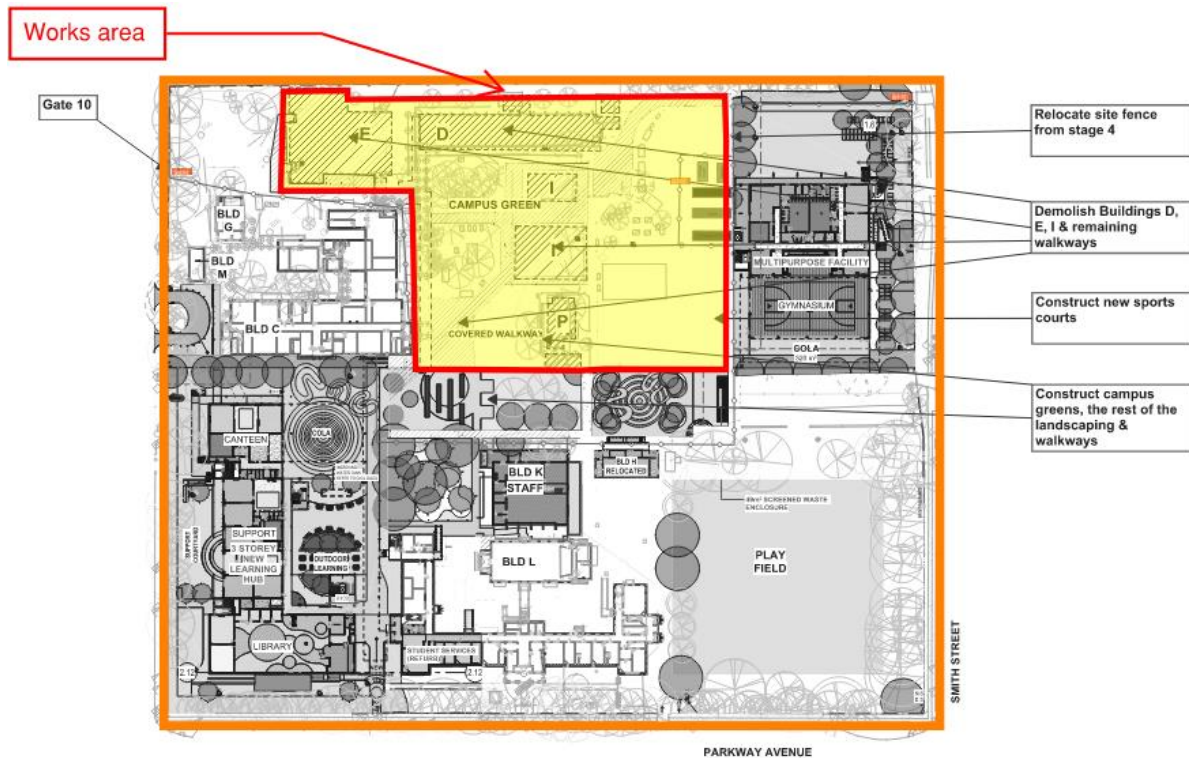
Stage 5 - Indicative site plan with site boundary plus works area highlighted.
